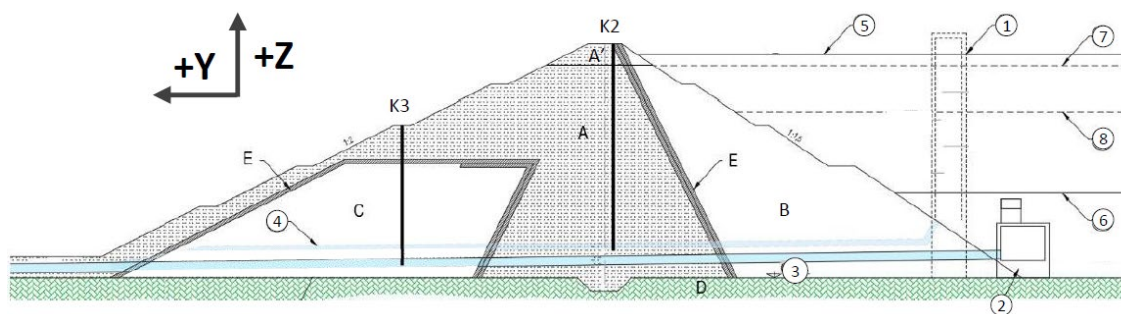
Typical cross-section of the dam with piezometers K2 and K3: (1) intake tower and (2) intake structure at the upstream dam toe, and (3) the two bottom outlet pipes and (4) the irrigation pipeline along the dam foundation.
